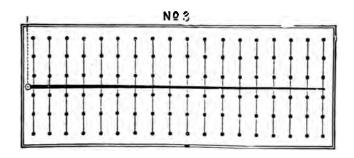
shows other approved plans for risers, feed pipes, and sprinklers. An arrangement of open sprinklers with one line on the outside of the building under the cornice is sometimes used.
